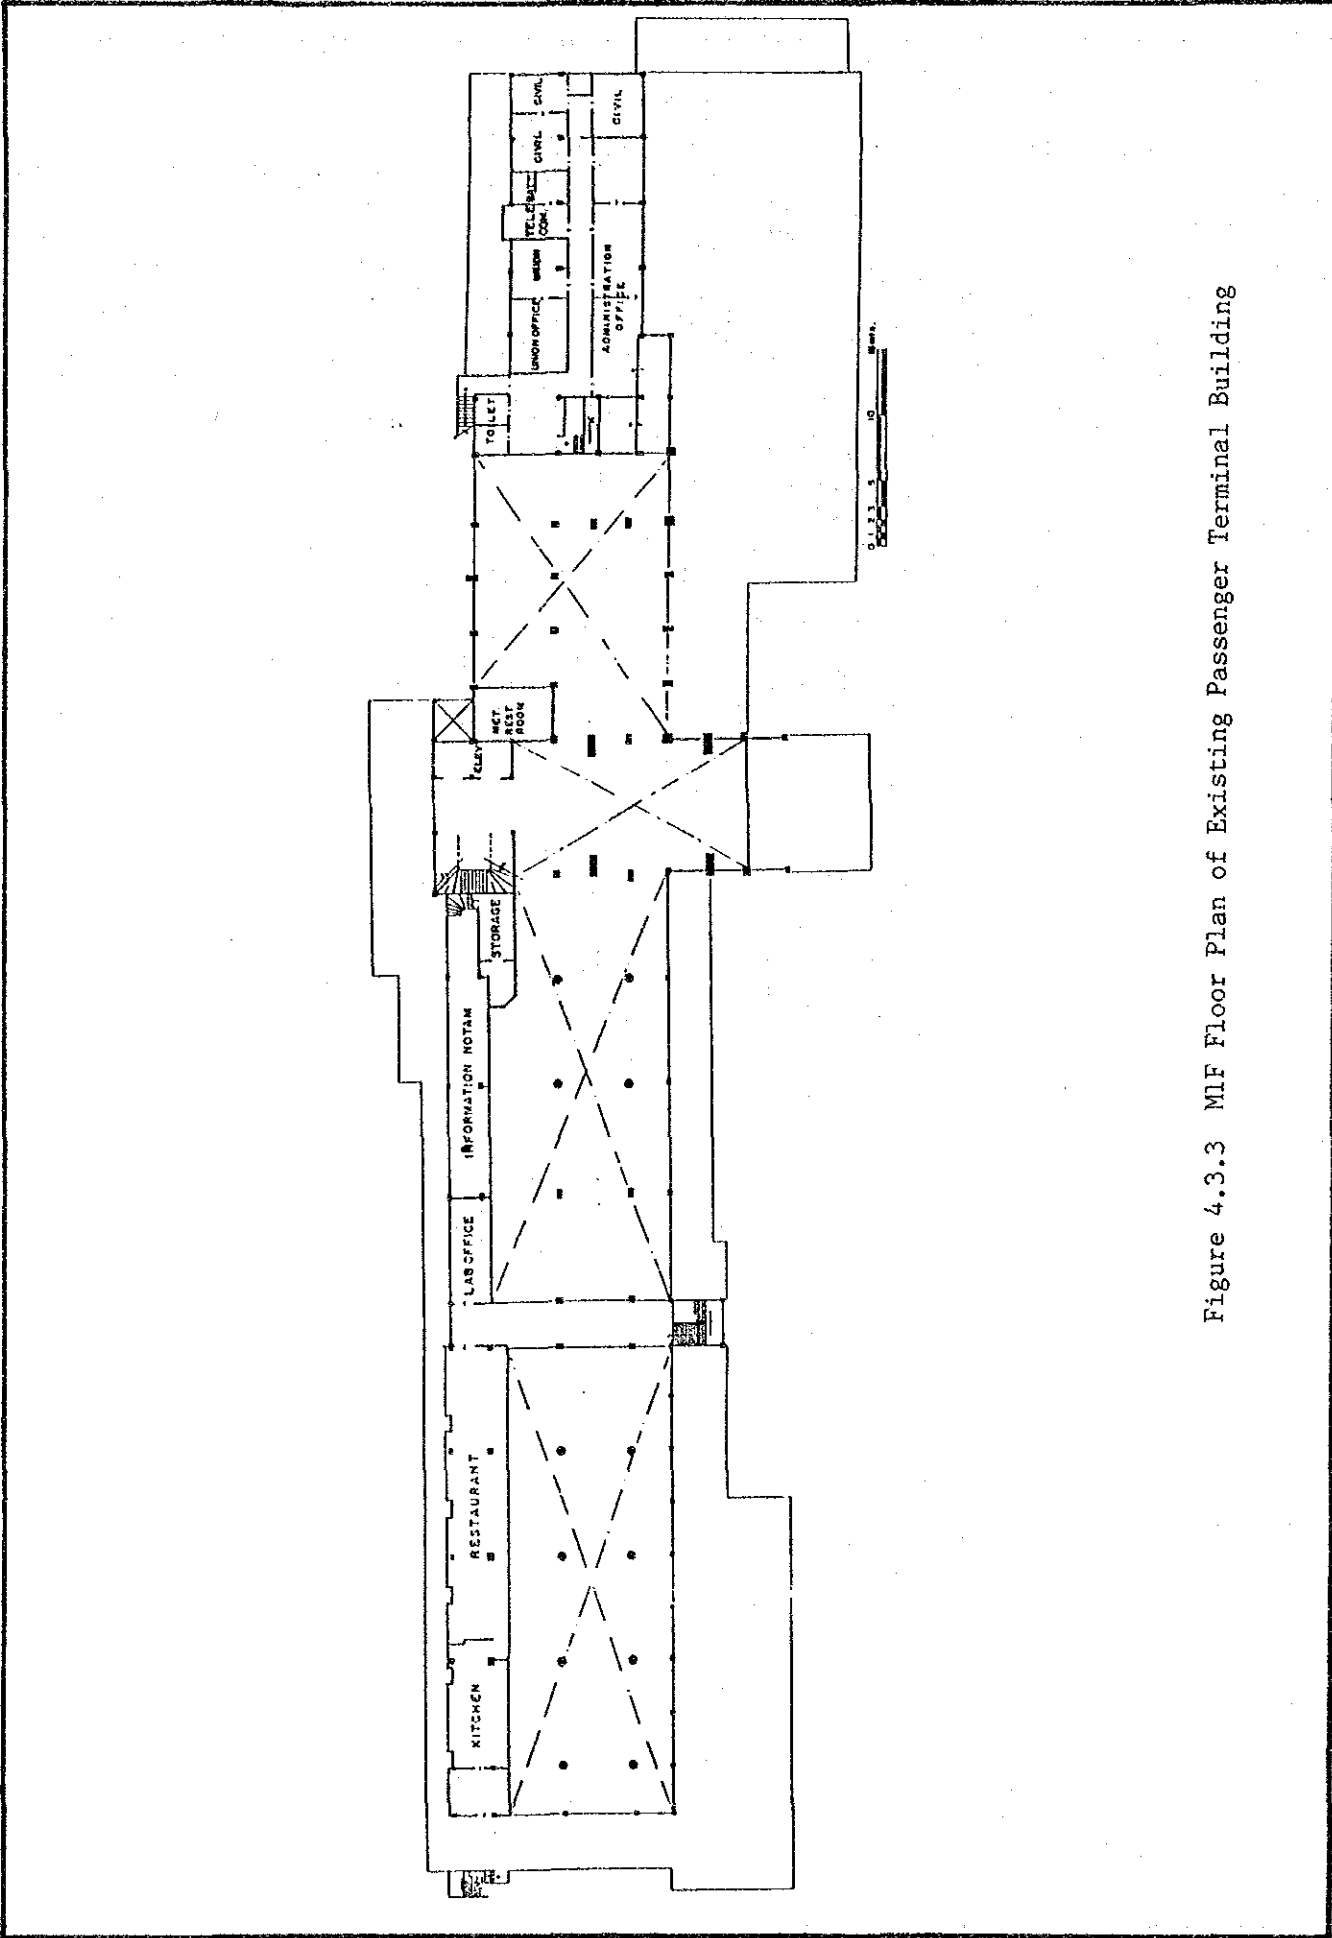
M1F Floor Plan of Existing Passenger Terminal Building
